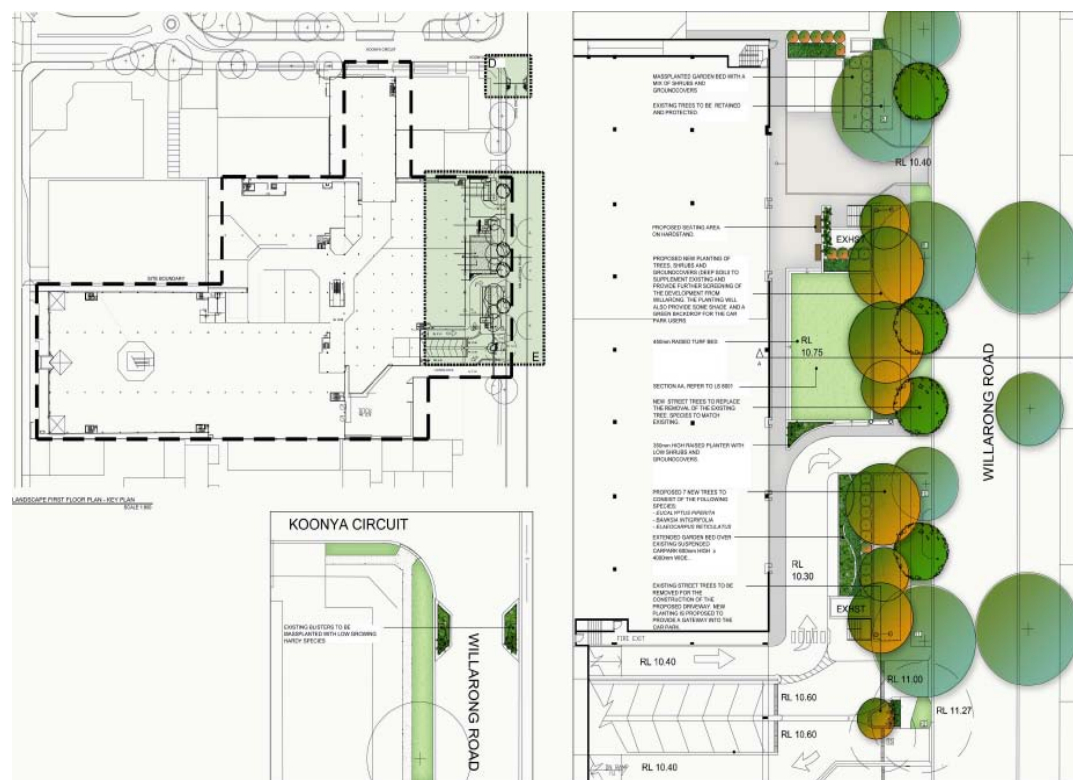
Proposed reconfiguration of the driveway and the landscape layout plan for the Willarong Road frontage
